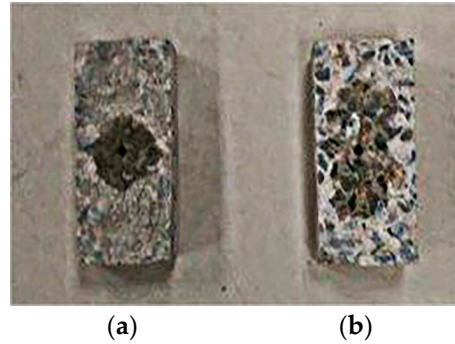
Wet area of test specimens. (a) Specimen BI. (b) Specimen BII.
